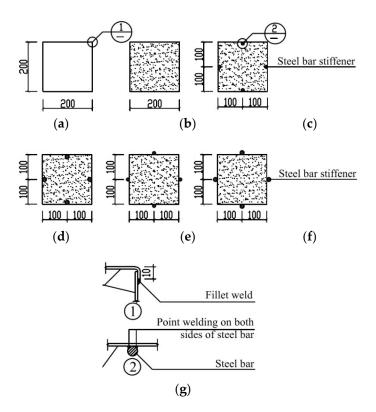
Section details of the specimens. (a) C1; (b) C2; (c) C3; (d) C4; (e) C5; (f) C6; (g) connection details.
